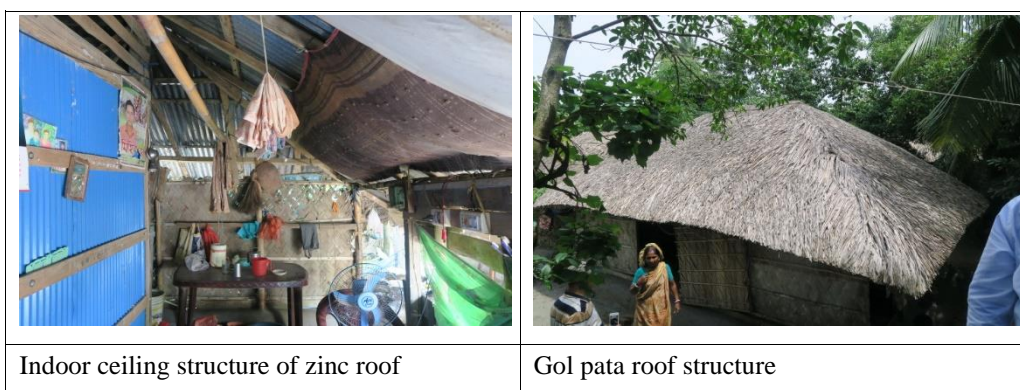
INTERIOR AND EXTERIOR STRUCTURES OF A HOUSE CEILING
